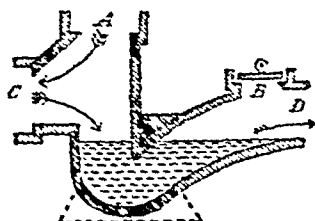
Plan of a Disconnecting Trap (Buchan's), showing Inlet from House (C); Ventilating Opening (A); Exit to Sewer (D) at other extremity of Siphon bend; and Inspection Opening (B).
